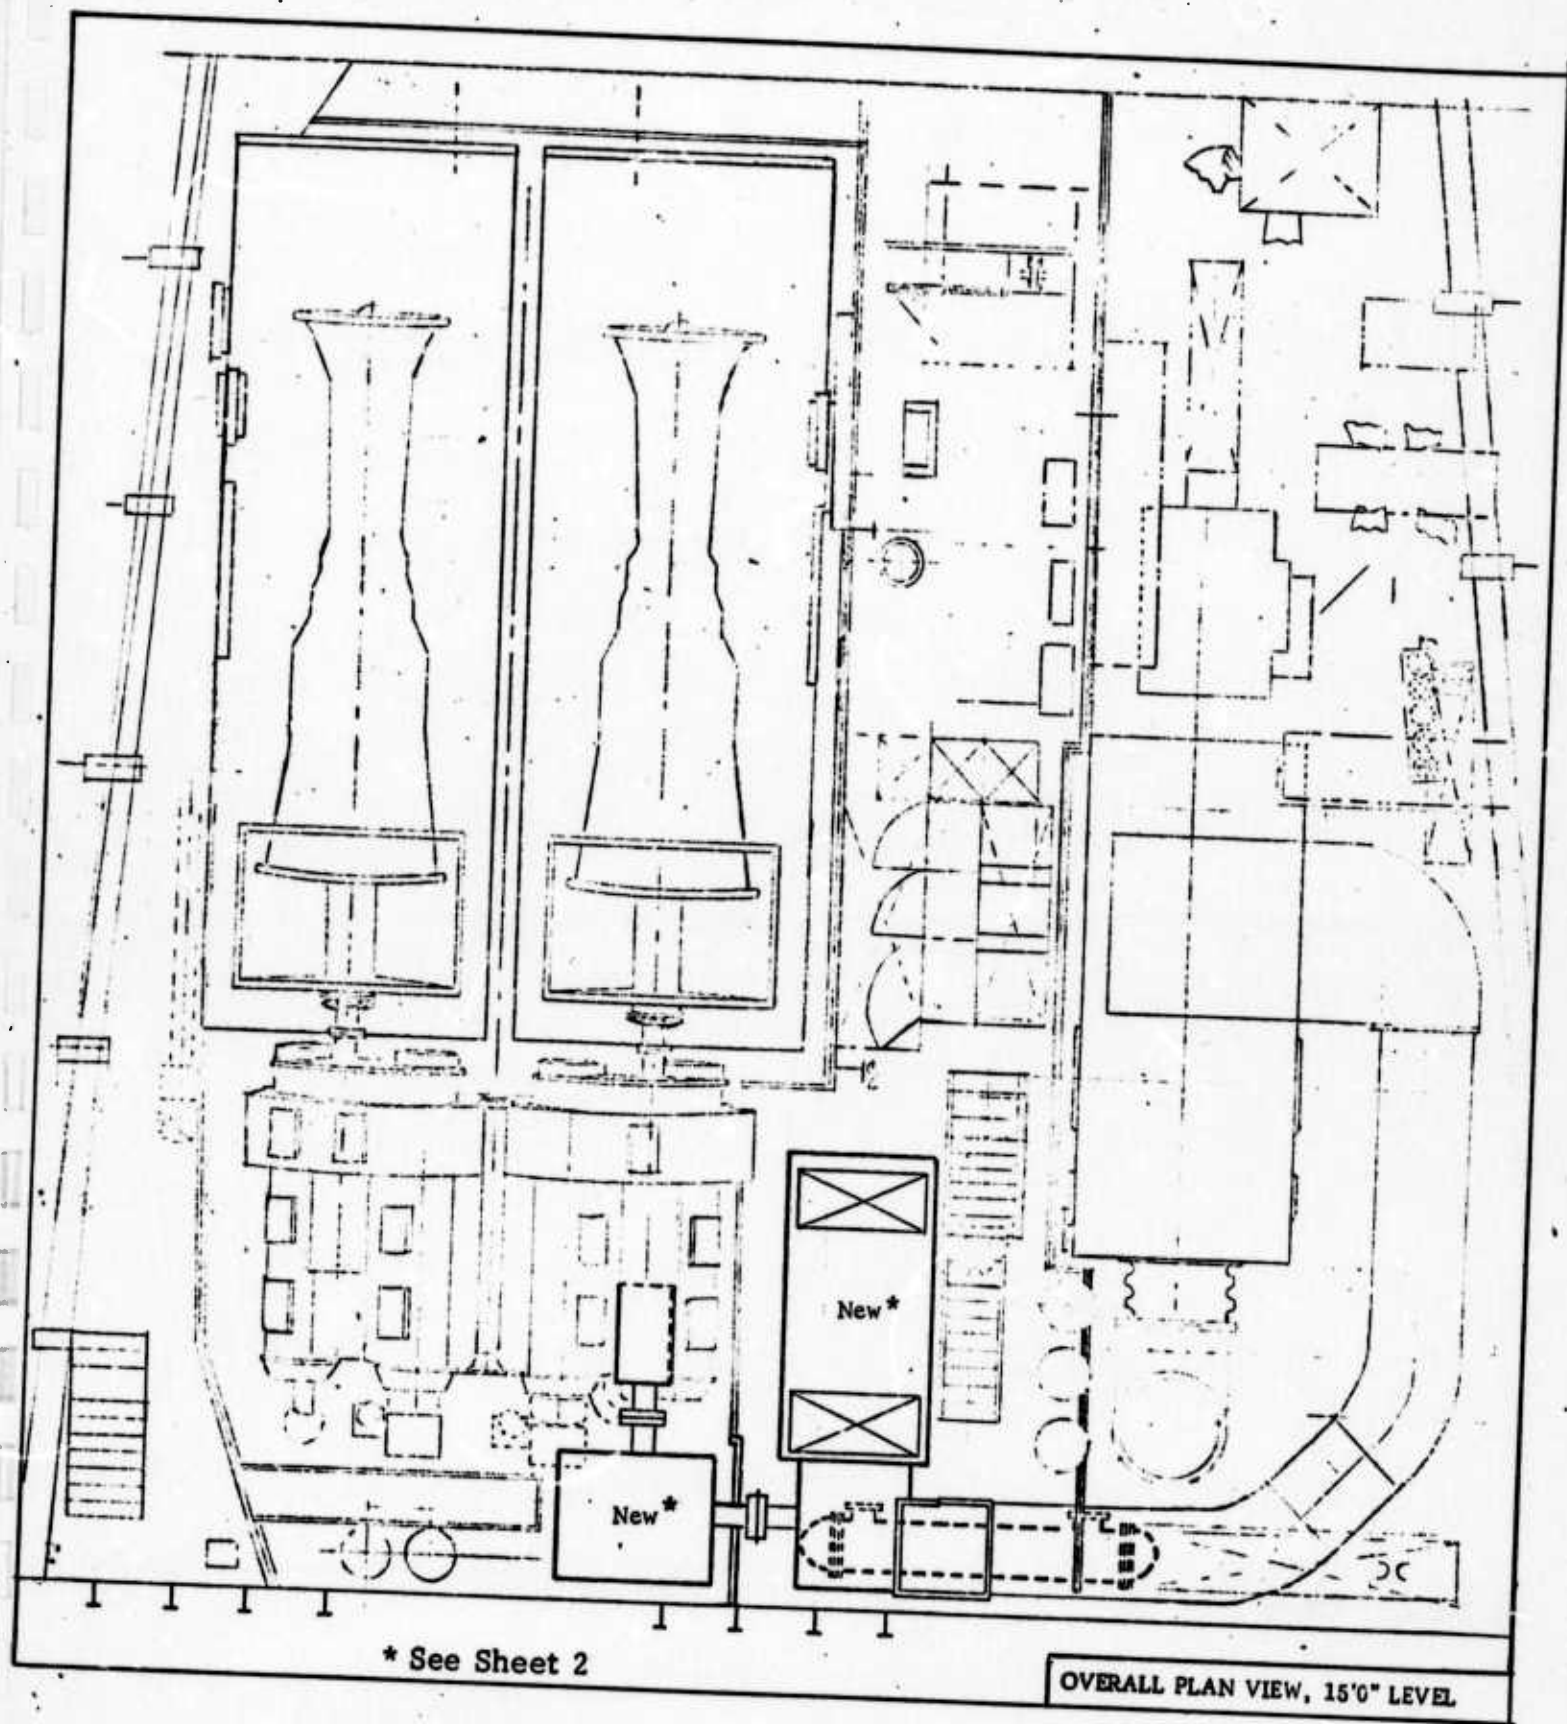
, Sheet 1. Addition of Cruise Turbines
